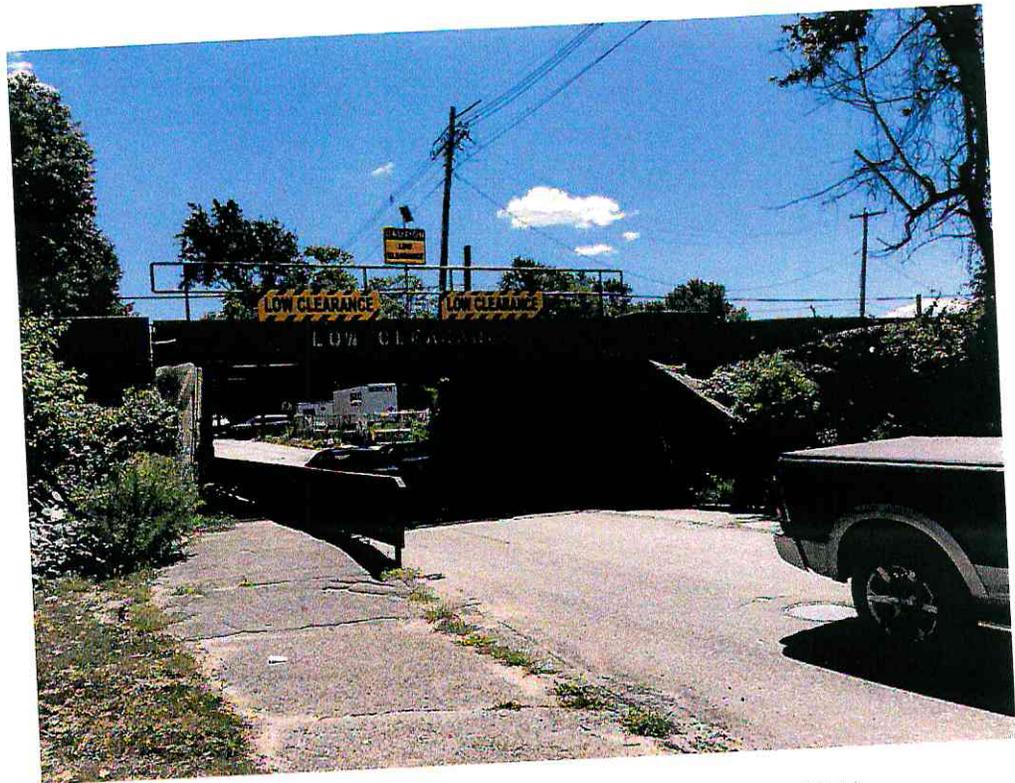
Location p – Cross St. looking east. Middle of Bridge.
